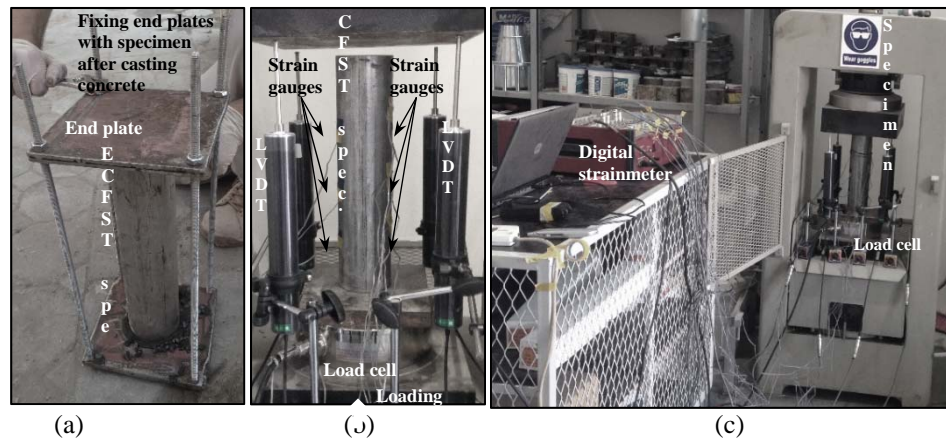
Fabrication and testing process: (a) fixing end plates after casting of concrete; (b) arrangement of measuring devices; and (c) overall test setup.
